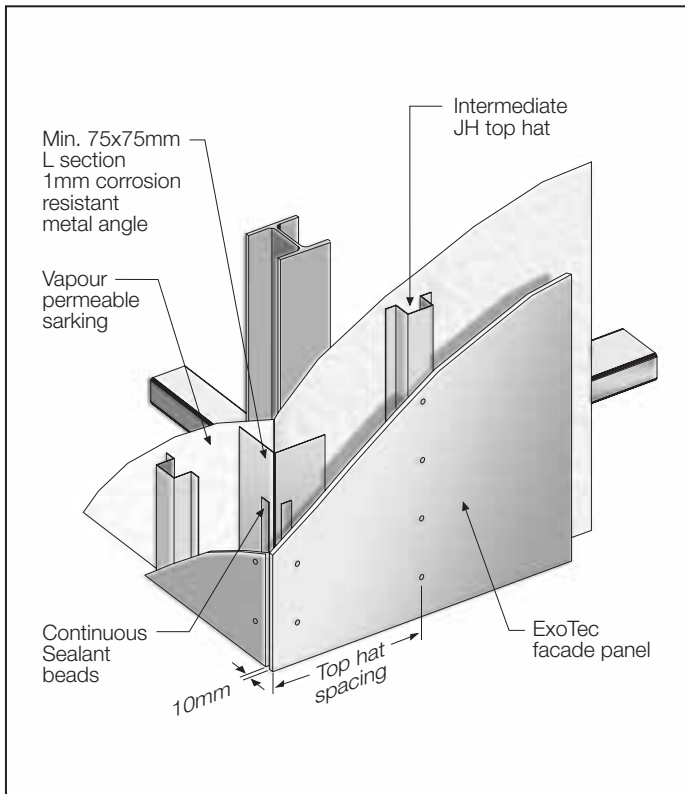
EXTERNAL CORNER CUTAWAY DETAIL
